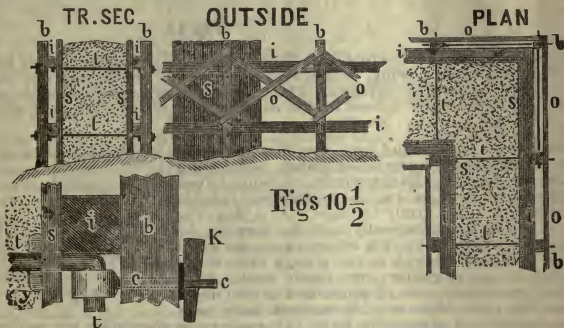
½ show the plan, outside view, and transverse section, to a scale of 20 ft to an inch, of a coffer-dam on rock, in 8 to 9 ft water, used successfully on the Schuylkill Navigation.
